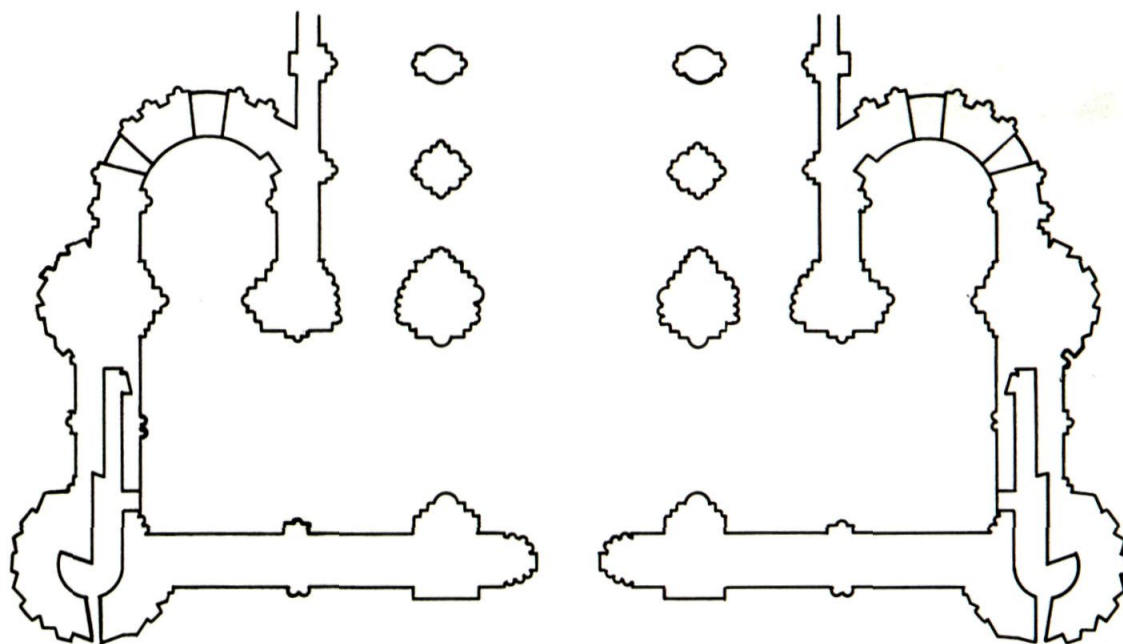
Ely Cathedral. Plan of west transept as originally built. (author's restoration: drawing by K L Clark).
